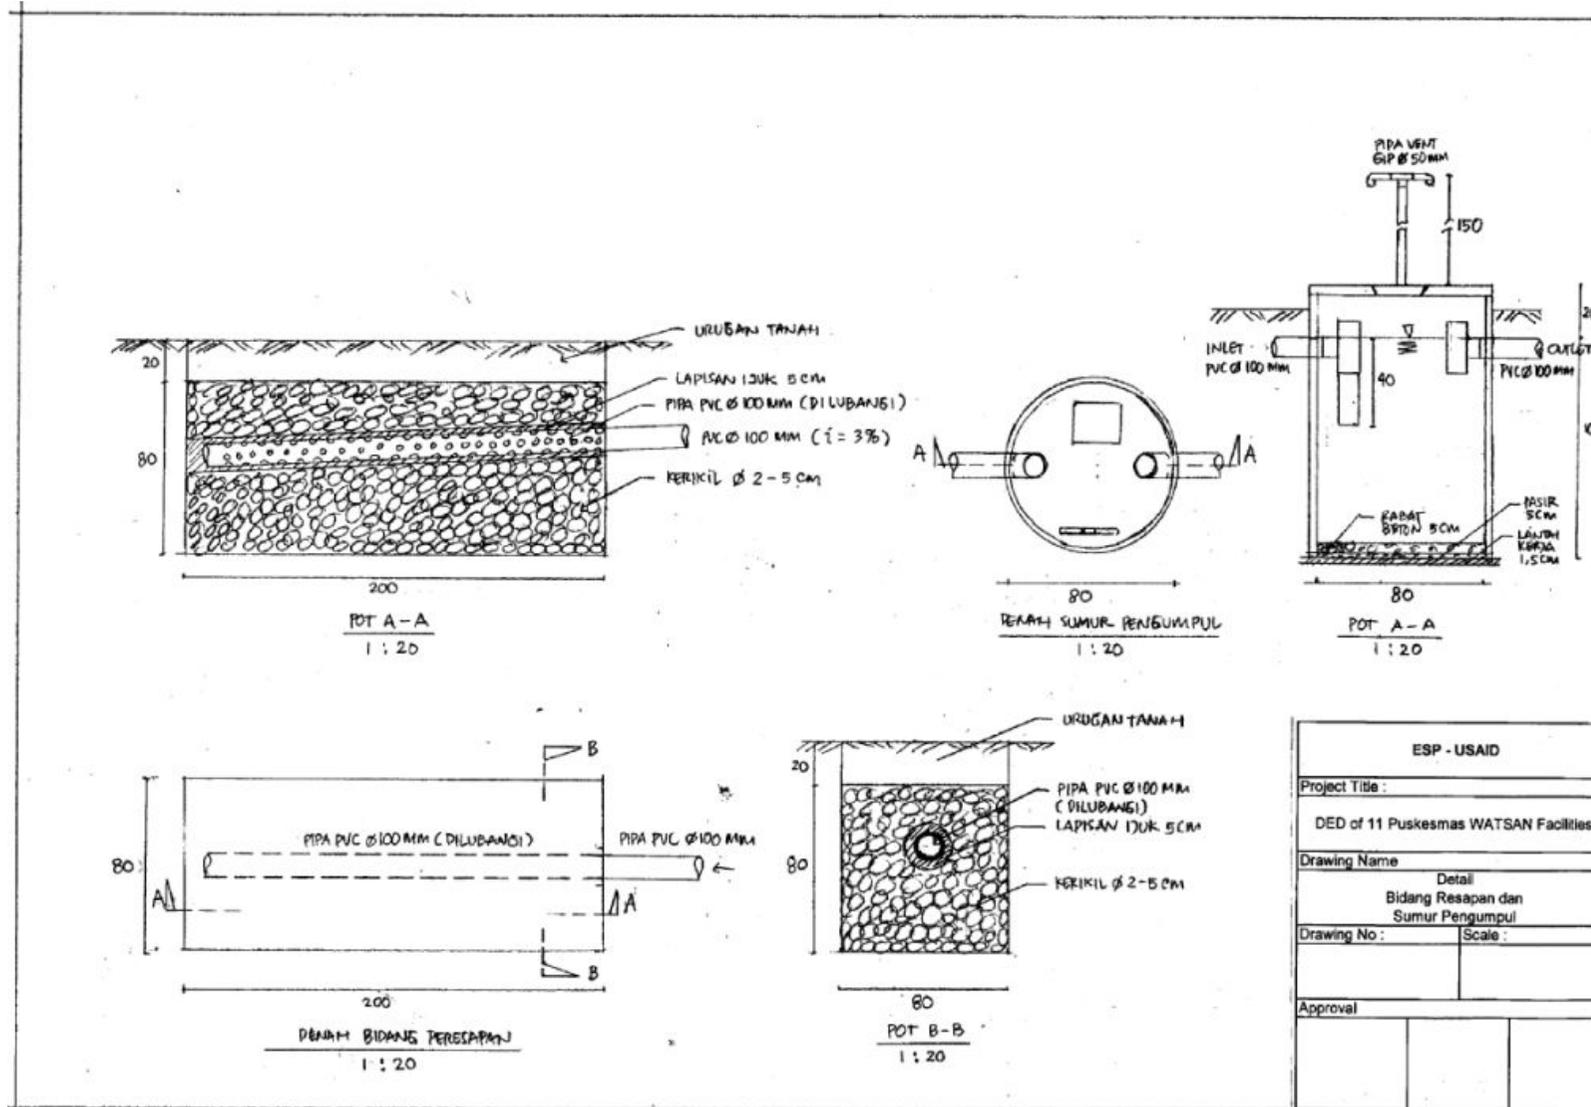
DETAILED ENGINEERING DESIGN OF WATSAN FACILITIES
